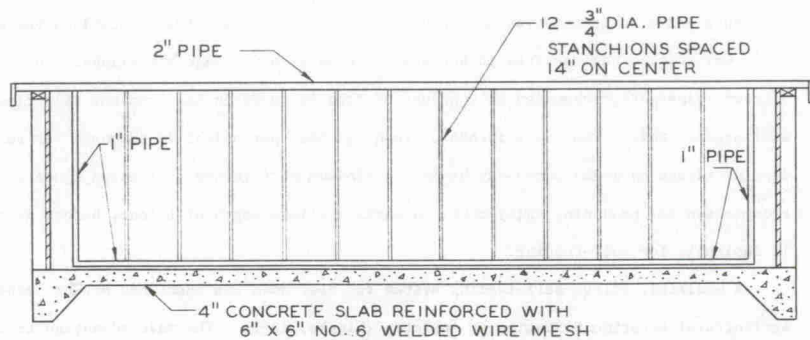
Construction details for stanchion-type feeding gate for horizontal silos. When this type of gate is used for stack silos, a fender attached to each end of the gate and extending along the edge of the slab will help prevent wastage of silage.
